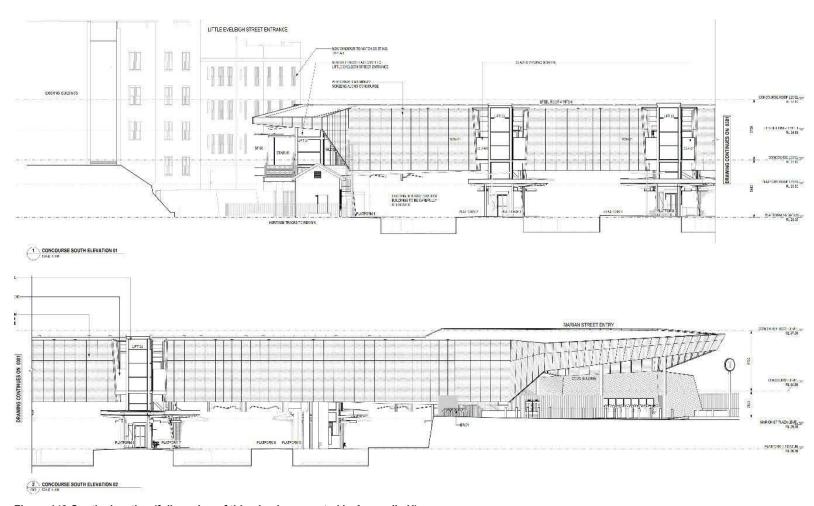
South elevation (full version of this plan is presented in Appendix H)
